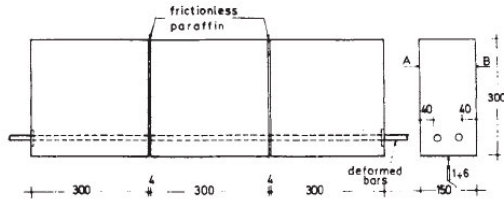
Specimen for investigation of the dowel anism. 1 mm = 0.0394 in.
